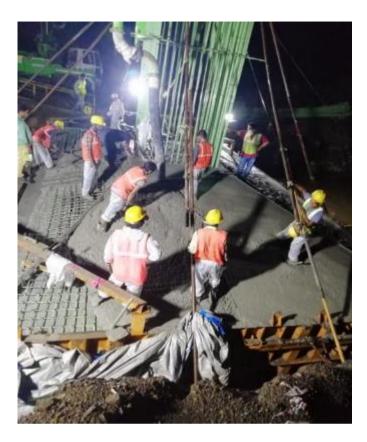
Concreting Works at Foundation No. RP 01 LHS in progress
